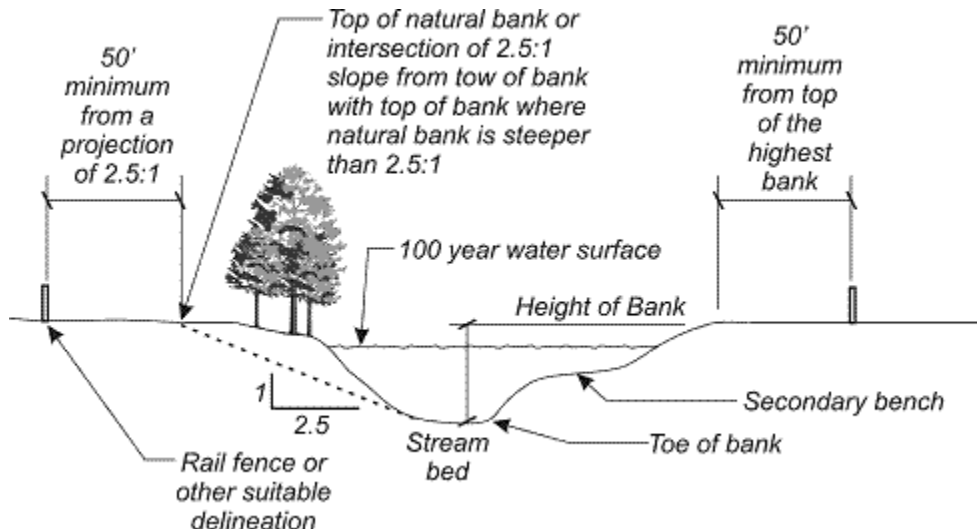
Setback with defined bank (see exceptions Section 20-30.040.D.4.)
